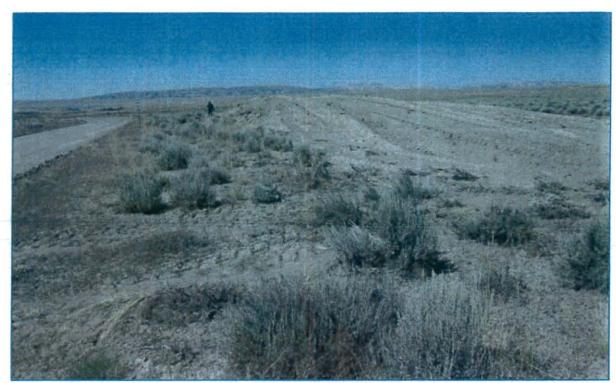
(above) looks southwest and shows the topsoil stockpile that has been constructed adjacent to the Access Road. Photo 4 (below) looks south at the active pit area (boom and bucket of the trackhoe are barely visible just to the right of photo center). Overburden from the initial boxcut has been stacked to the northeast. In the foreground is a windrow of what is construed to be suitable material.
